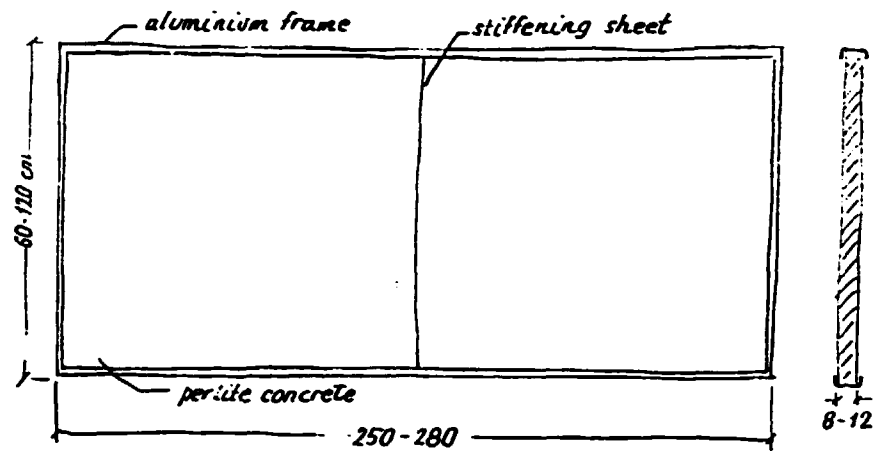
Prefabricated perlite concrete wall unit in aluminium frame
